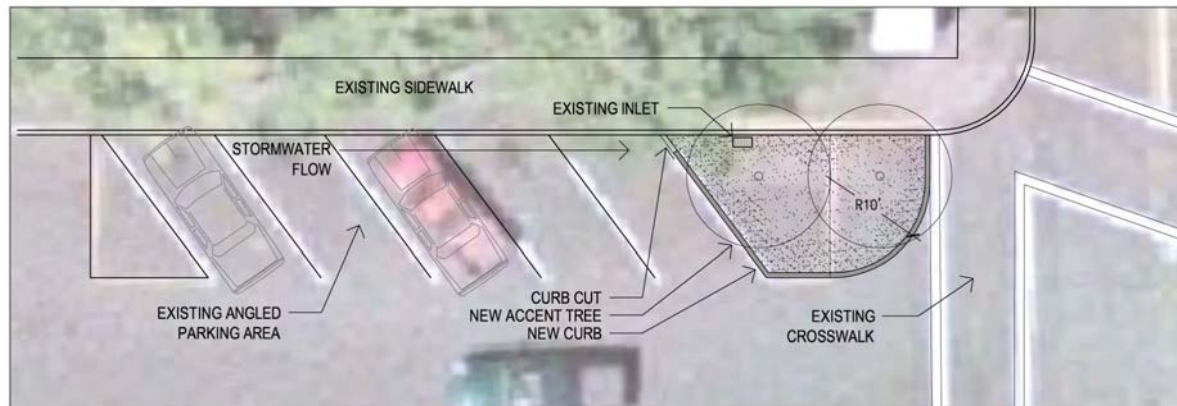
Multnomah Village Stormwater Retrofit Pre-design Site MV-S7
